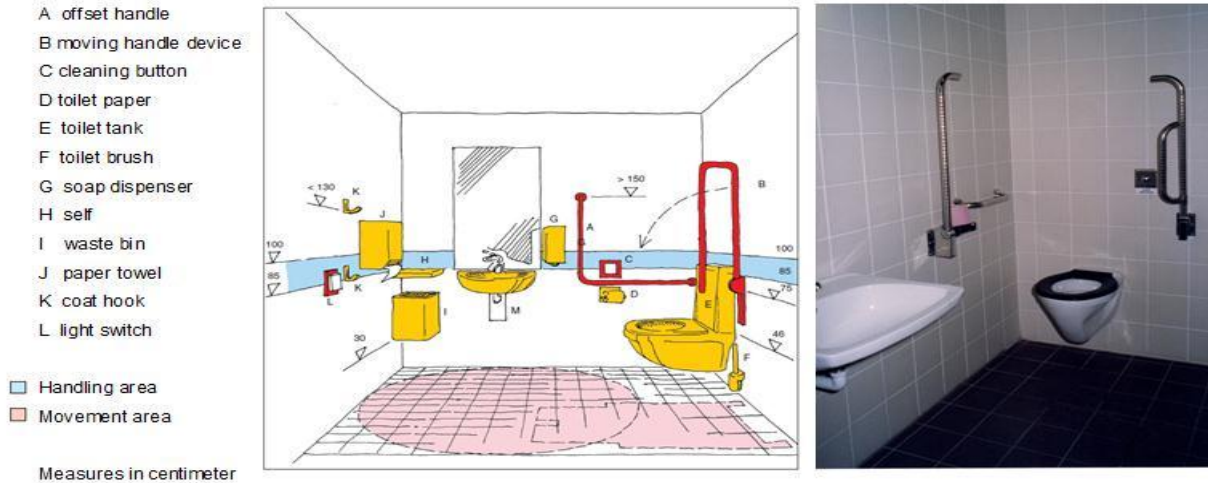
layout of wheel chair accessible restrooms, photo © Wiener Linien
